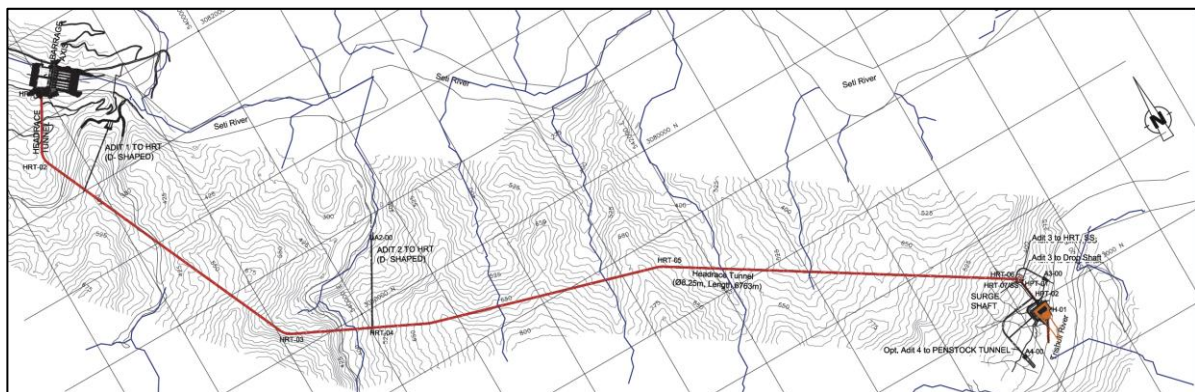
Layout of Tunnel (Source: Detail Design Report, 2021)
